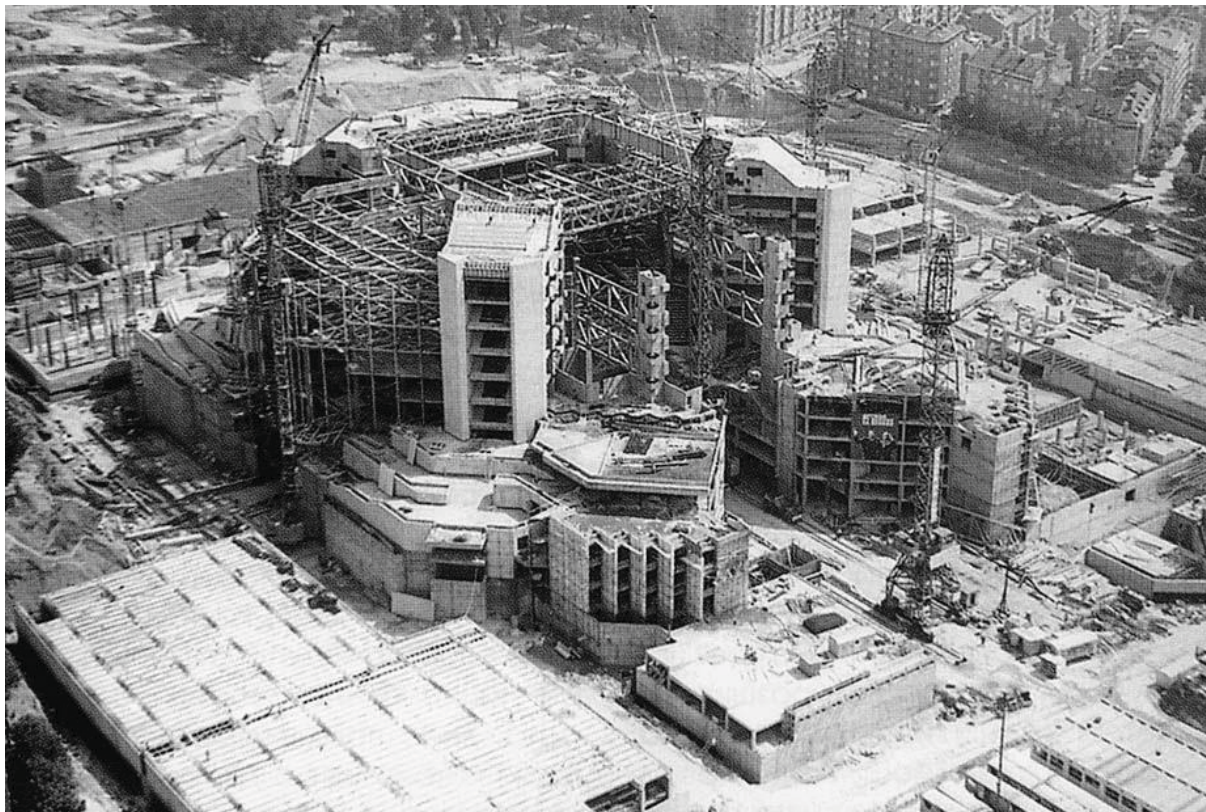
Photo of the building construction. Source: Valeva, M. [Балева, М. НДК има 10 000 тона конструкции – В „Строител“, 12.08.2011, <http://vestnikstroitel.bg>]
